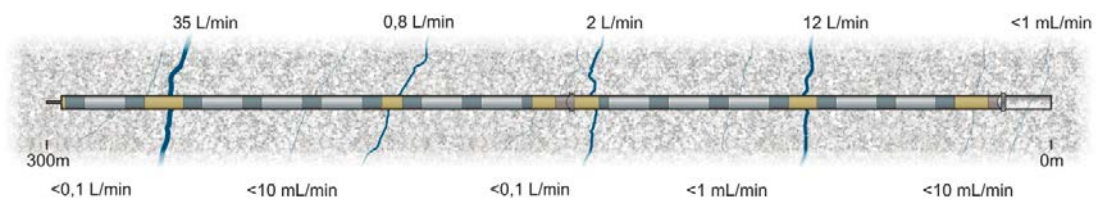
Schematic drawing of the KBS-3H drift design in the wet case.
